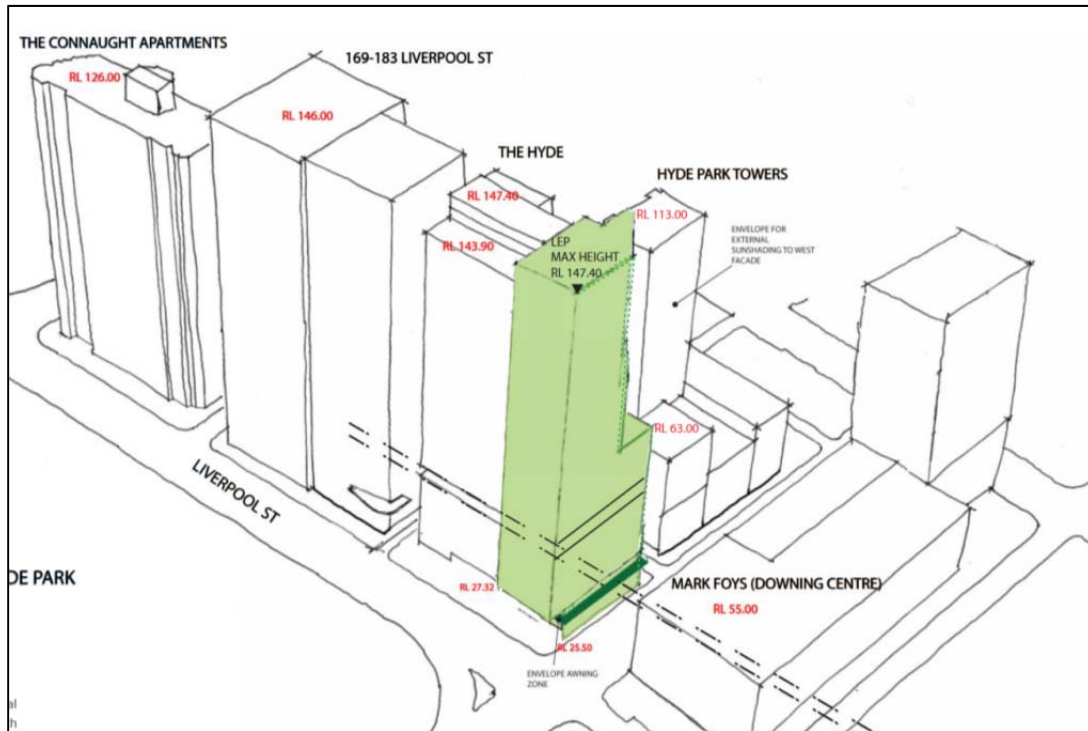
Aerial view of amended Stage 1 DA building envelope, which illustrates the chamfered edge on the southwestern corner
